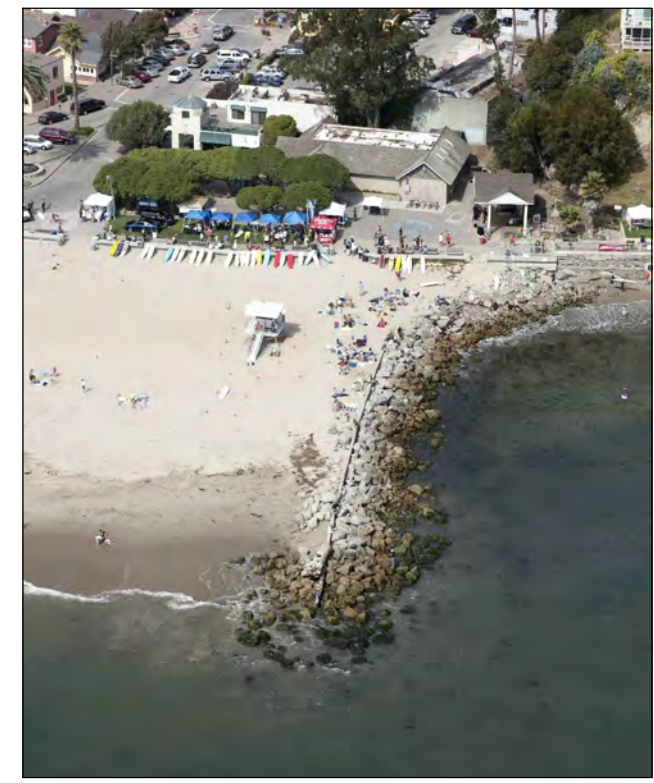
JETTY PRE—PROJECT (EXISTING)
